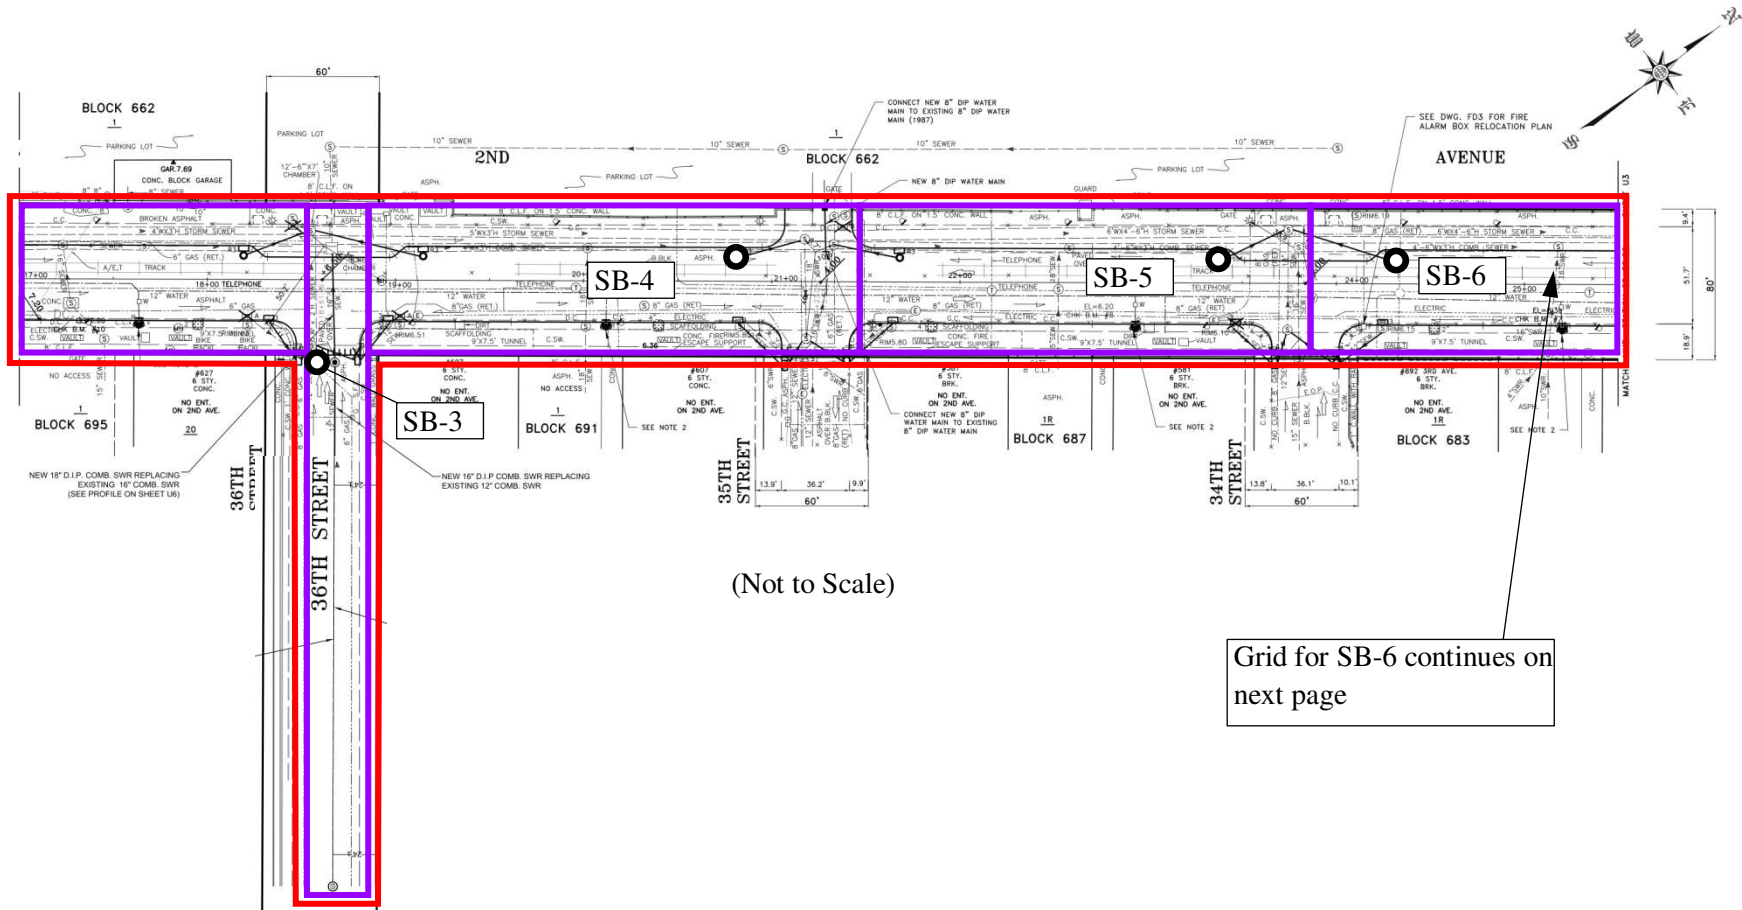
Soil Boring, Sample and Grid Location Plan
